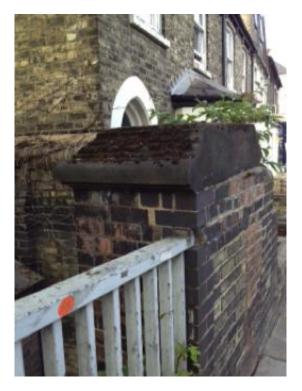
Bridge parapet (Caro Wilson, 2015)
